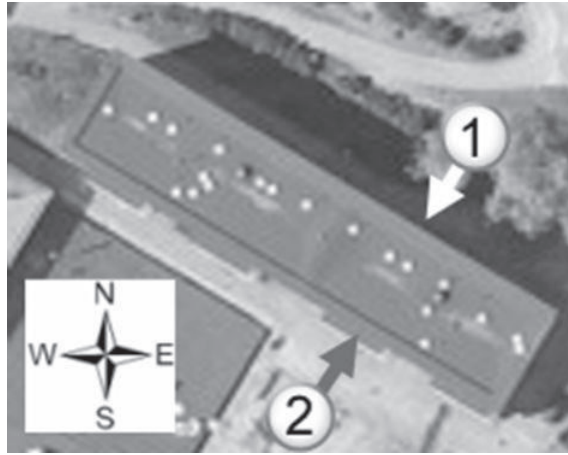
Location of the monitored locations of the building facade RF2-MWOOL: 1. north-eastern facade wall and 2. south-western facade wall.
